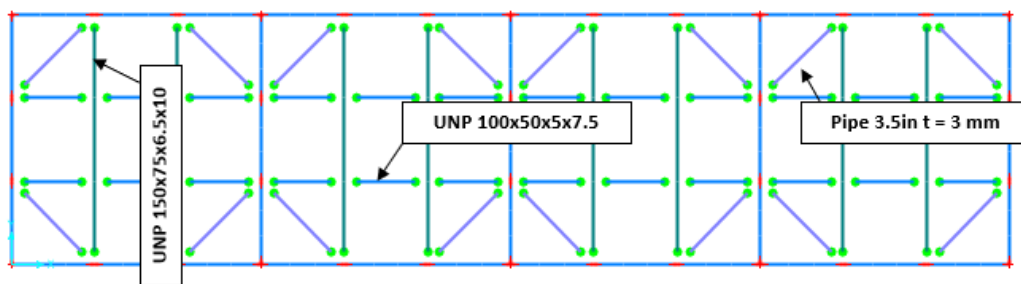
Steel brace frames on the building top elevation for extended module of the proposed structure.
